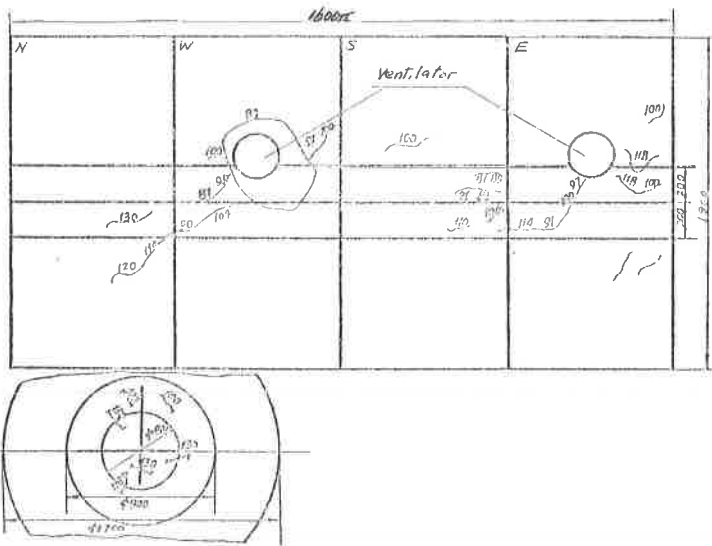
, Extension of cracks on the slab and barrel.
